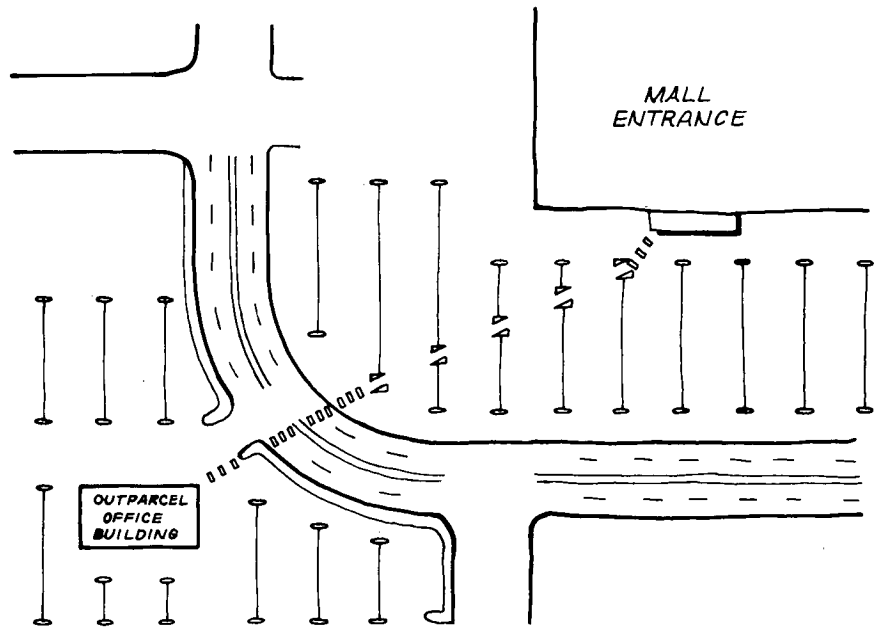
"Stepping stone" approach to assisting pedestrians across a wide, open parking lot.
